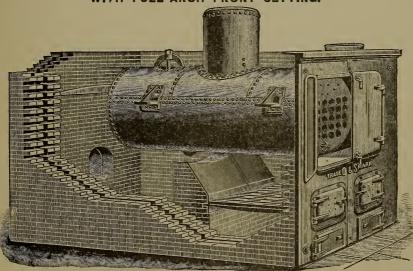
FIXTURES FOR FULL-ARCH FRONT BOILER:
